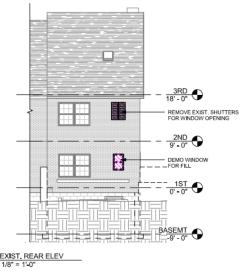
View of existing side and rear elevations showing the proposed demolition and encapsulation.
